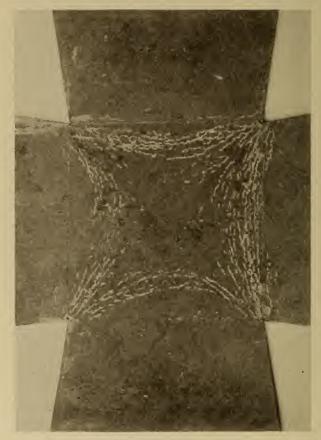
View Showing Compression Side of Cross-Bending Test Specimen After Test.
